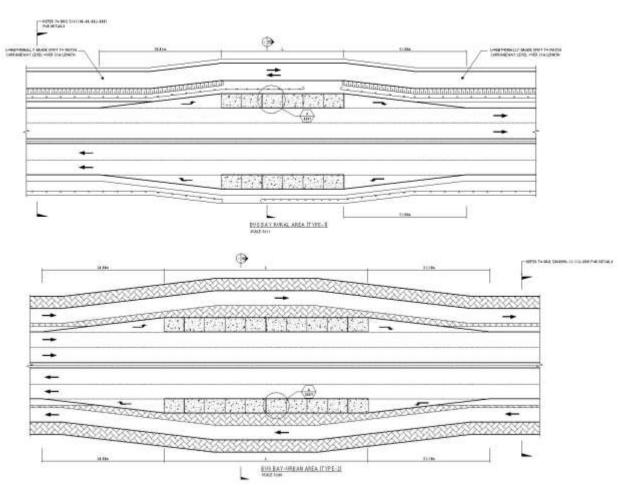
Layout Plan of Bus Bay at Urban and Rural Area
